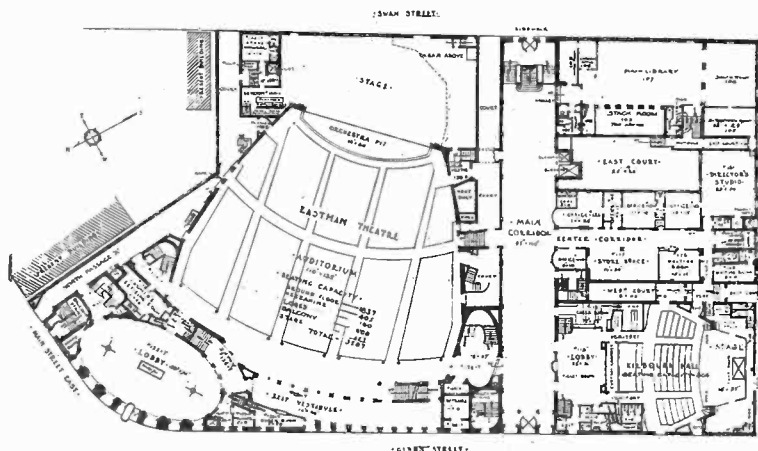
FIRST FLOOR PLAN OF THE EASTMAN THEATRE AND SCHOOL OF MUSIC
